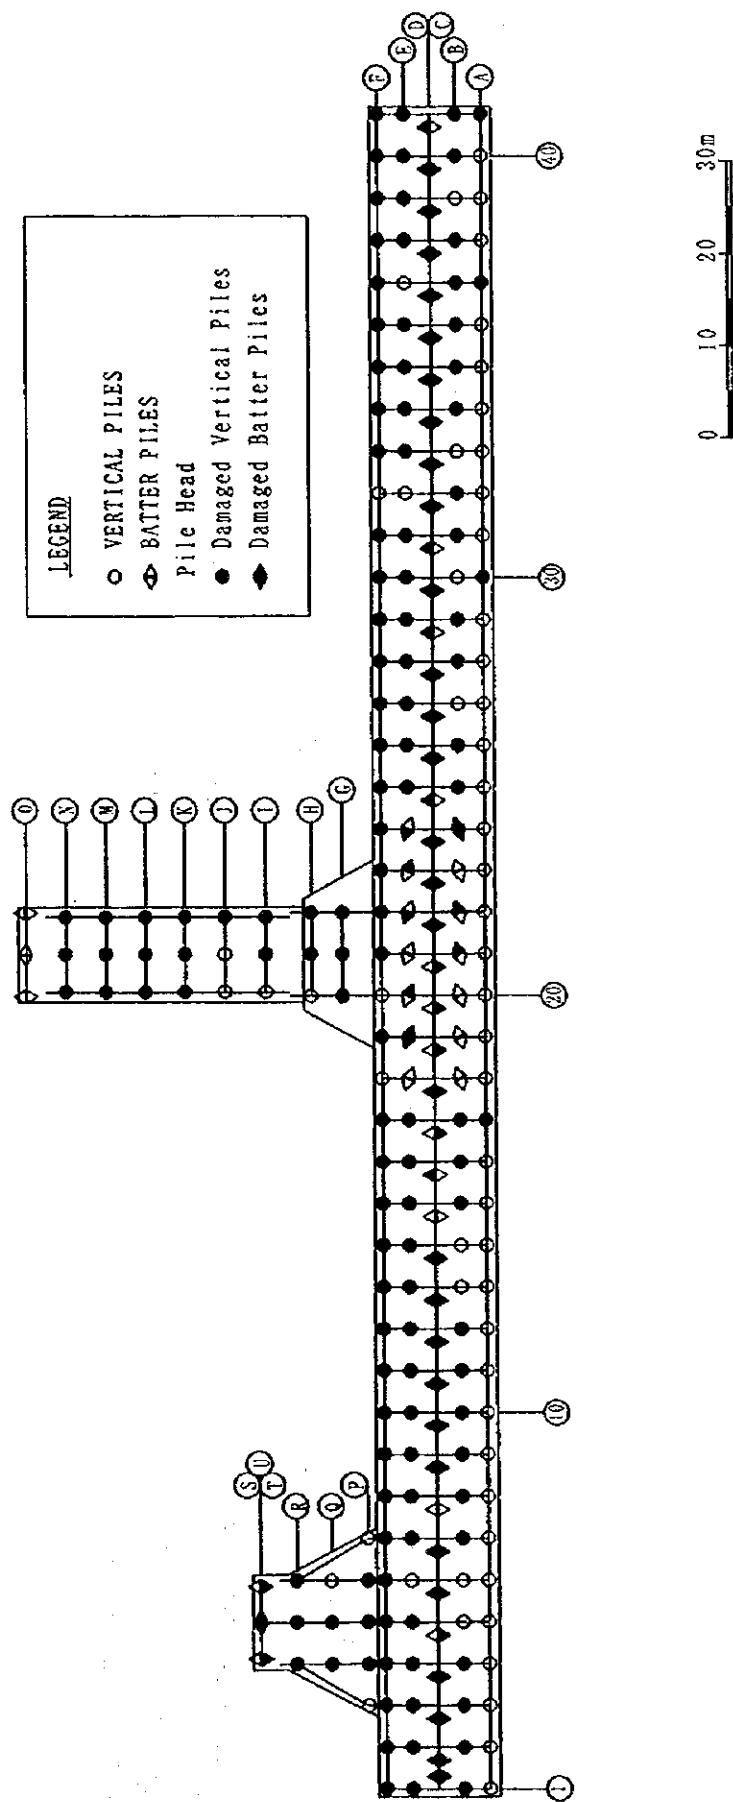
Location of Piles Damaged in Pile Head
